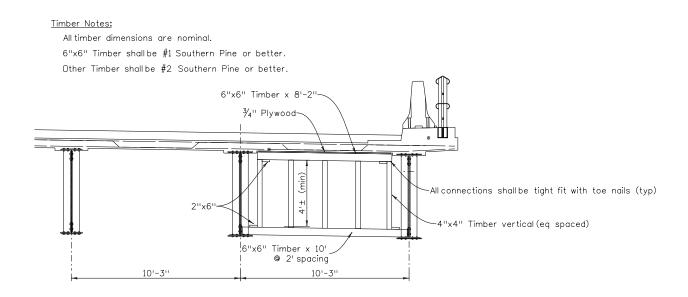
(I)-1 Sample Section of Falsework to support a deck
